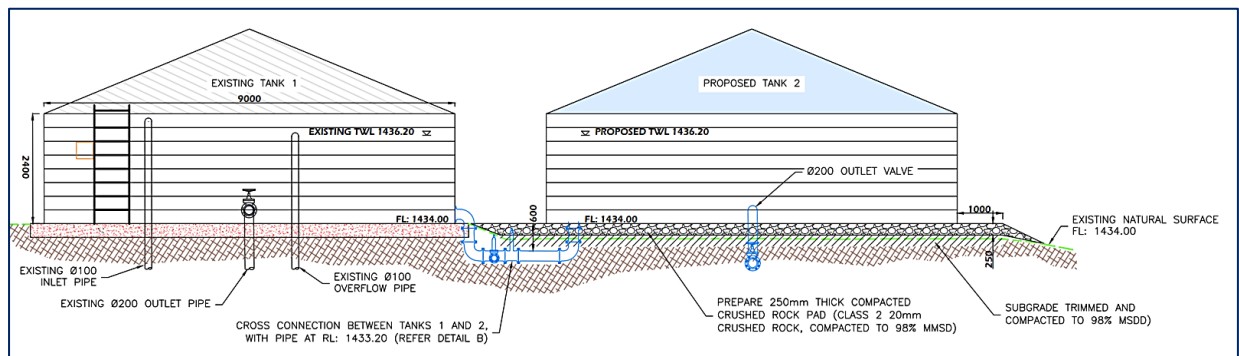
| Existing and proposed water supply storage tanks (Source: Applicant's SEE 2024)
